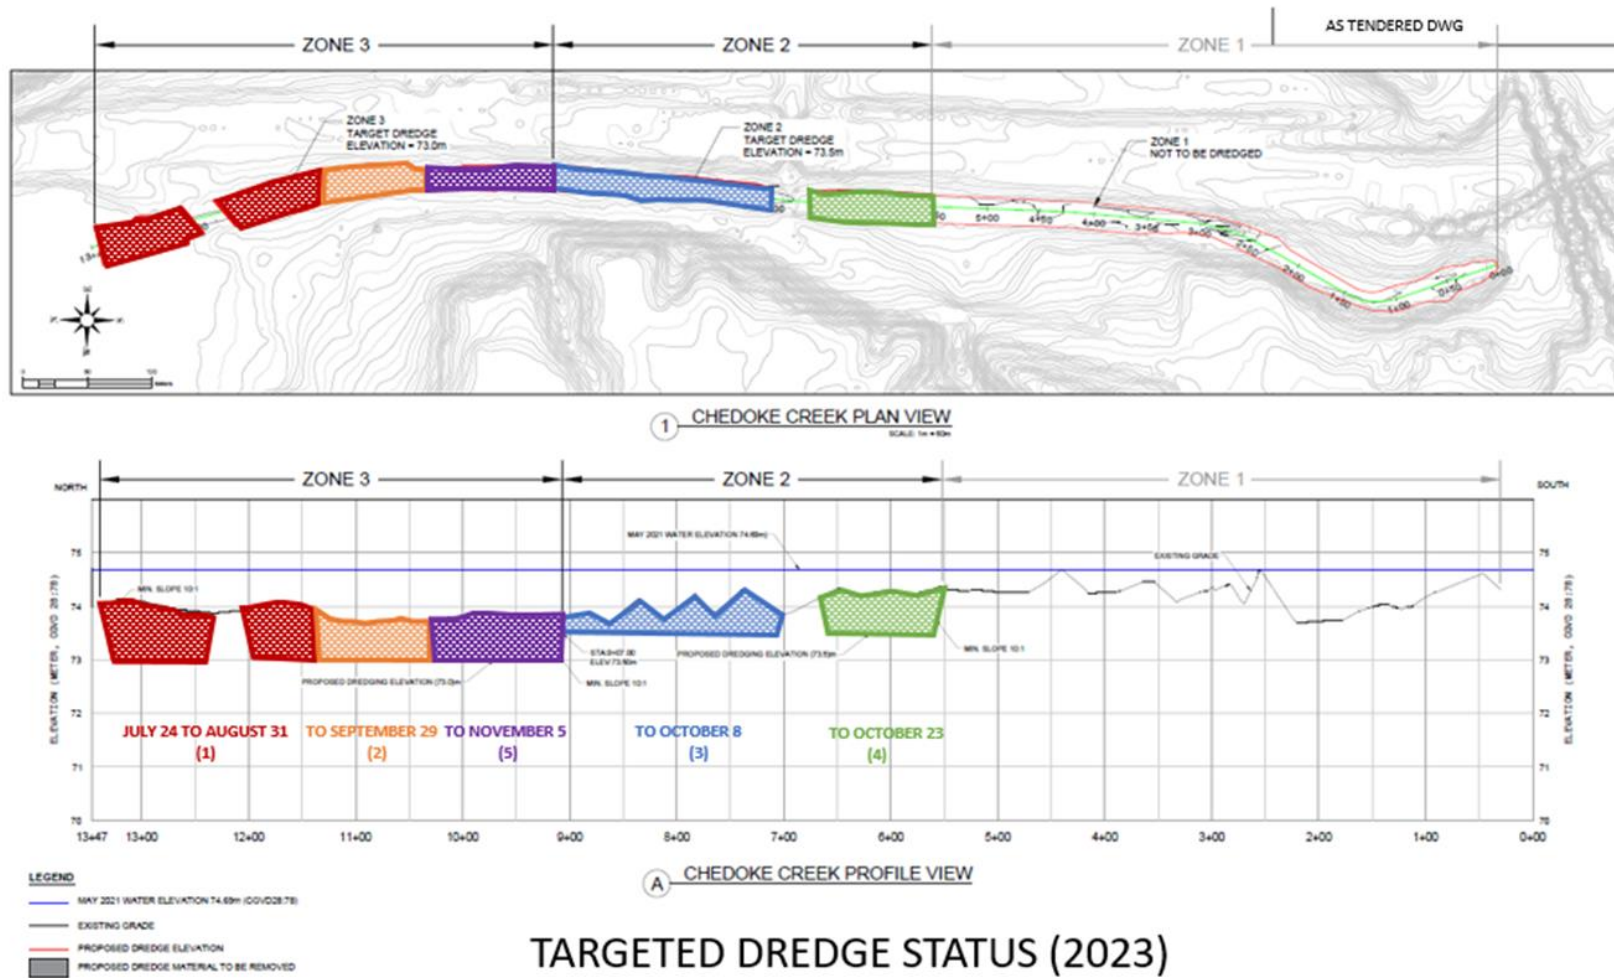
Chedoke Creek Plan and Profile View (as dredged)
